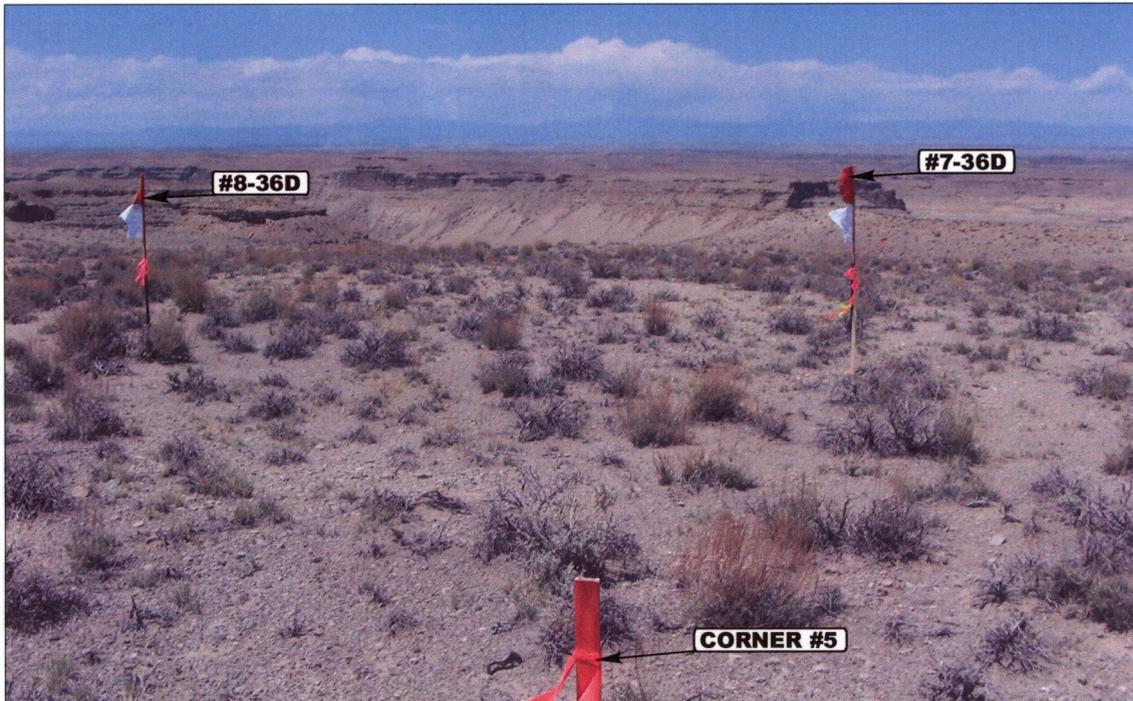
PHOTO: VIEW FROM CORNER #5 TO LOCATION STAKE
